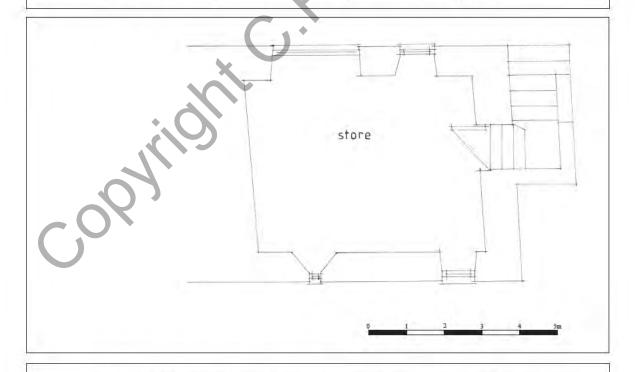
Existing First Floor Plan (Provided by Property Owner)
